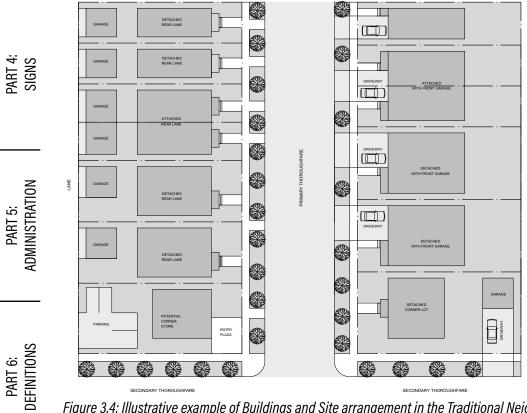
Illustrative example of Buildings and Site arrangement in the Traditional Neighbourhood District
